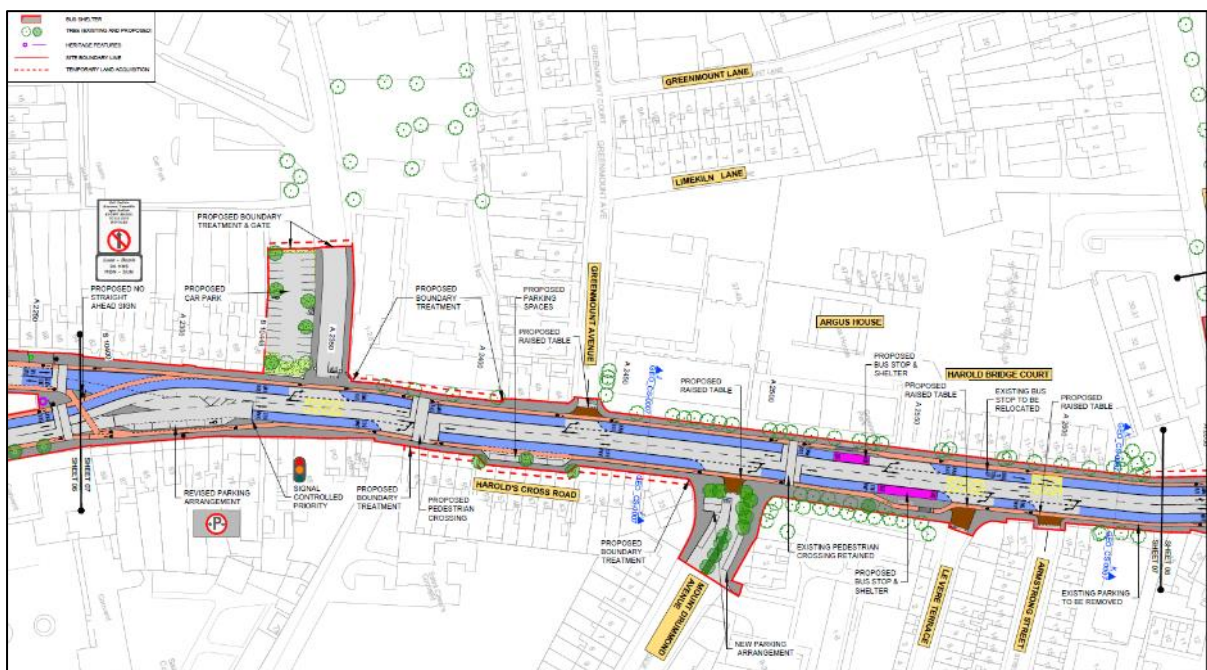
Extract from General Arrangement Drawings (Sheet 7)
